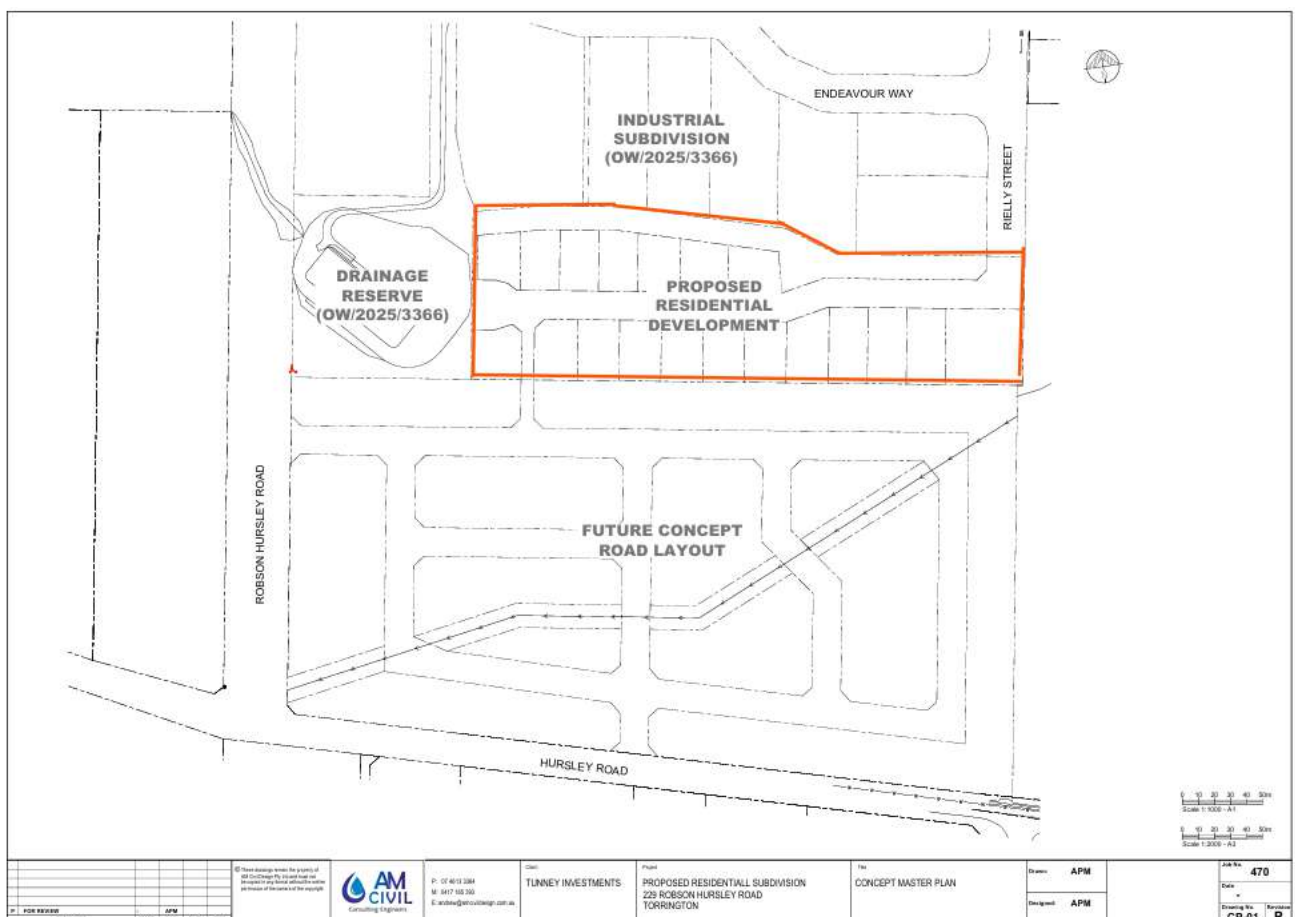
Local Area Masterplan (red border) with 18 house lots and a COS in contextual master plan.
